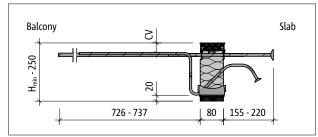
Schöck Isokorb® T type K-U-M2: Product section
